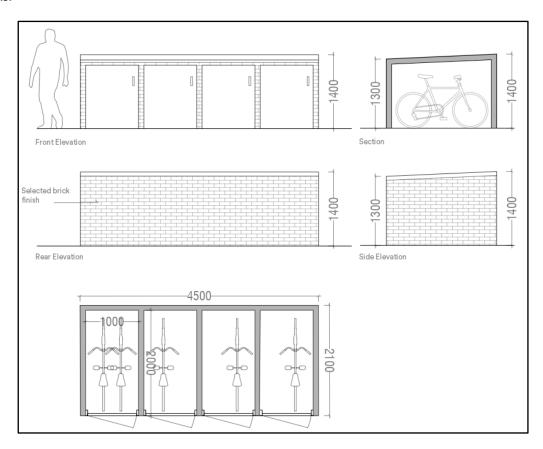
Extract from JFOC drawing no. 22.127.PD7001
